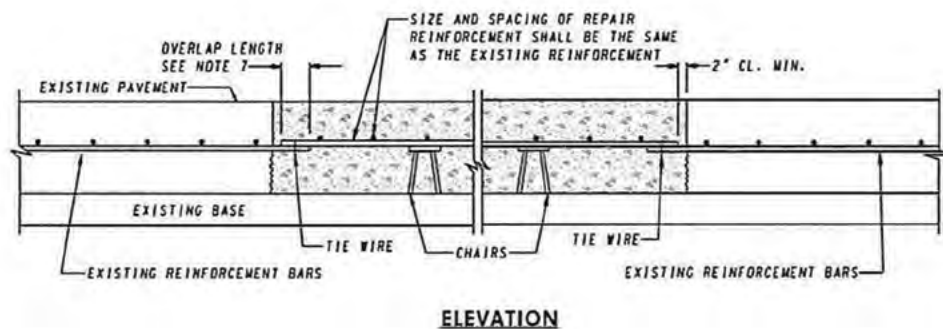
New steel in FDR tied to longitudinal reinforcement protruding from CRCP.
